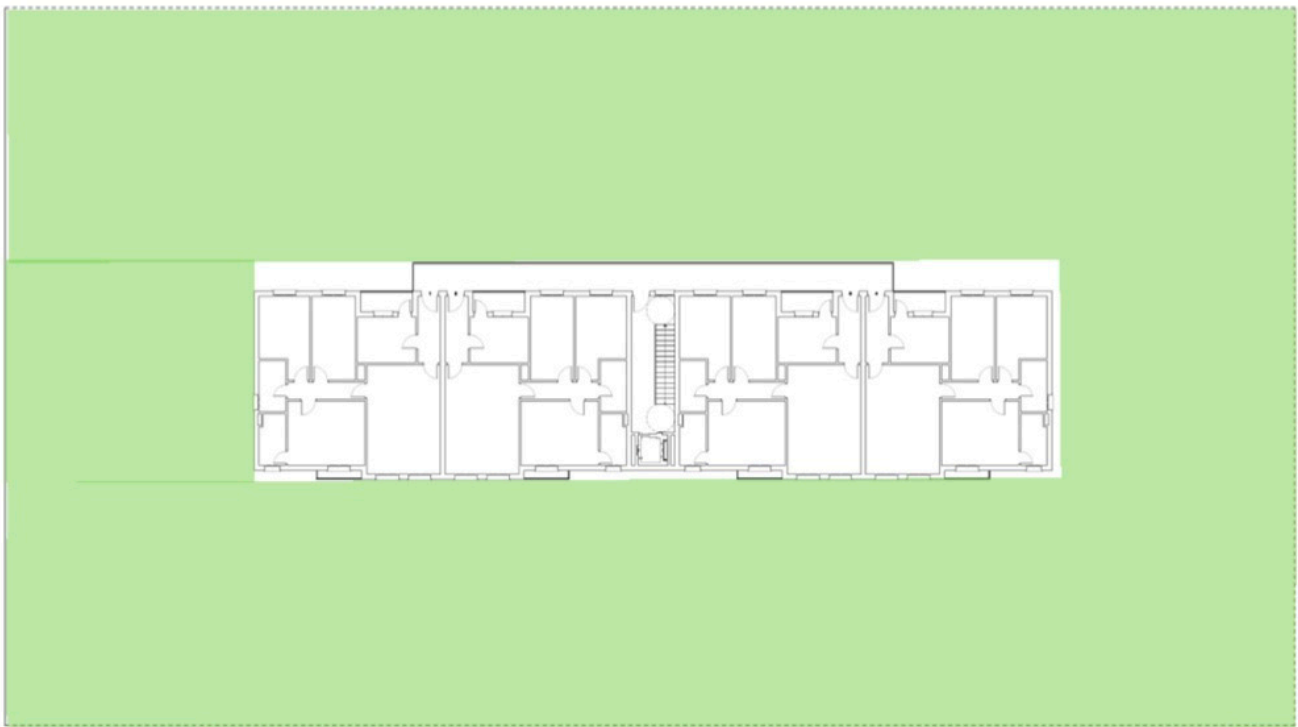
Resulting floor plan of a building of 16 units. In green open spaces, all collective.
